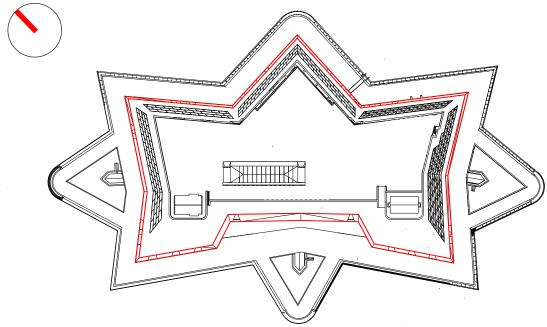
Plan diagram of Fort George showing extent of Rampart Railing
